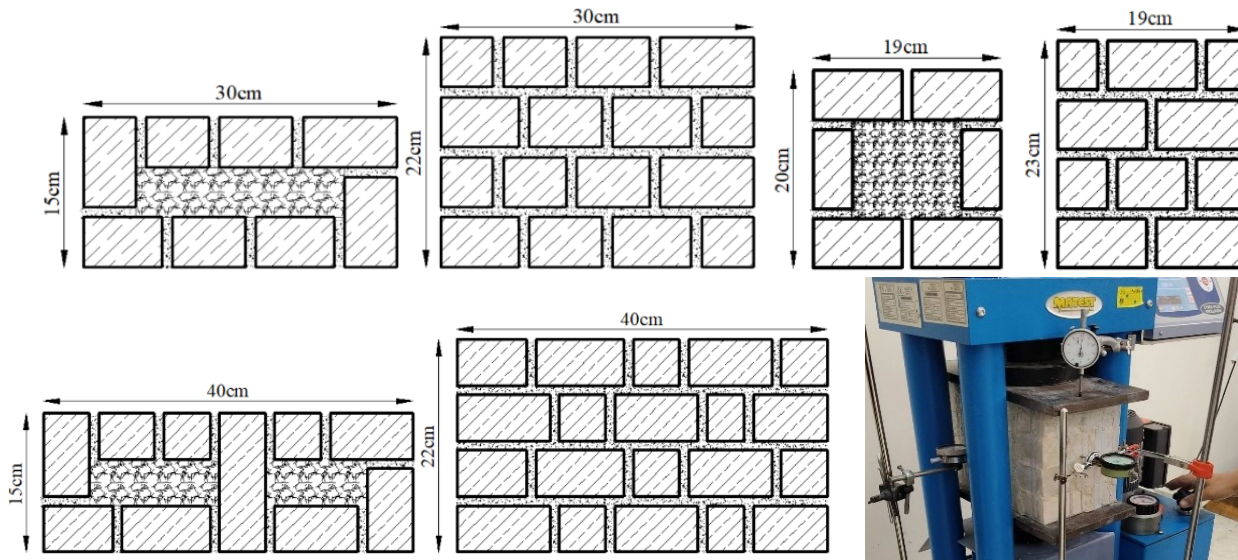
plan and elevation of 30 /20 /40 cm double leaf wallets, Compressive Strength of double leaf wallets.
